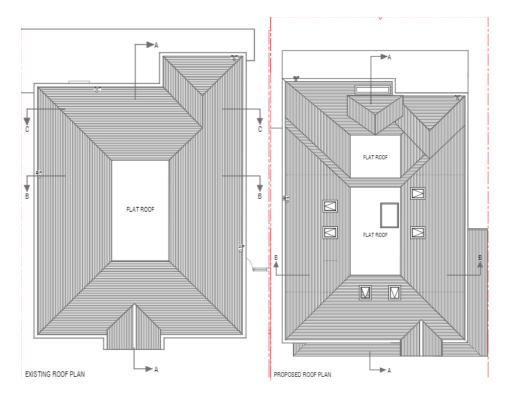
& 15 – Existing (left) and Proposed (right) roof plan
